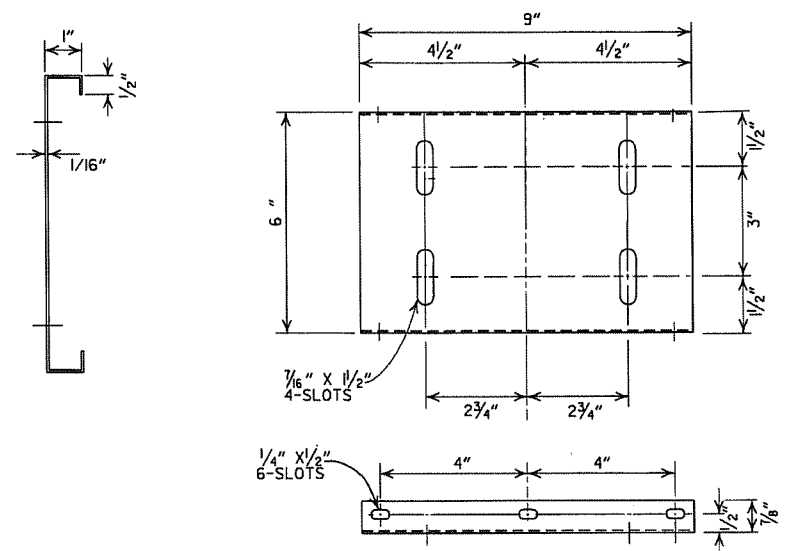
DETAIL OF TERMINAL ANCHOR POST (TYPE I)
